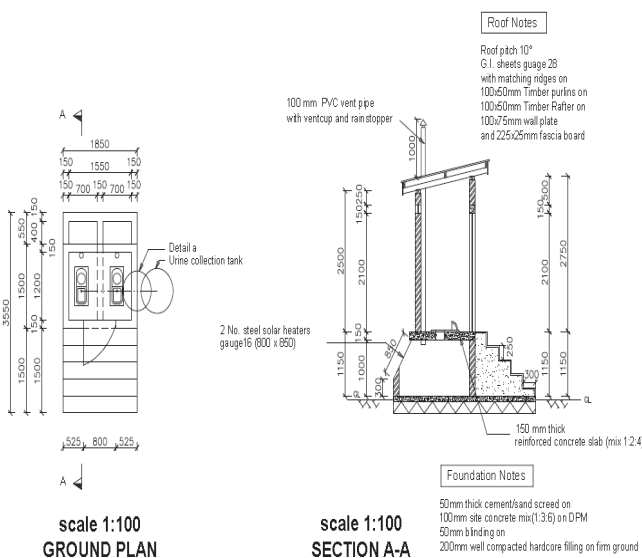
Drawing: Design of an ecosan toilet (Source: WSDF-SW)
